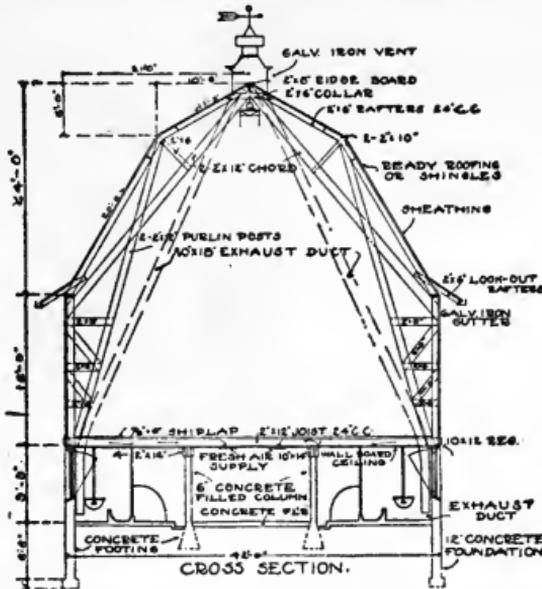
Cross Section of Dairy Barn, 42 Feet Wide, Showing Plank Frame Construction Truss. The Building is Wider on Account of the Central Alleyway to Make Room for the Manure Spreader Drawn by Four Horses
